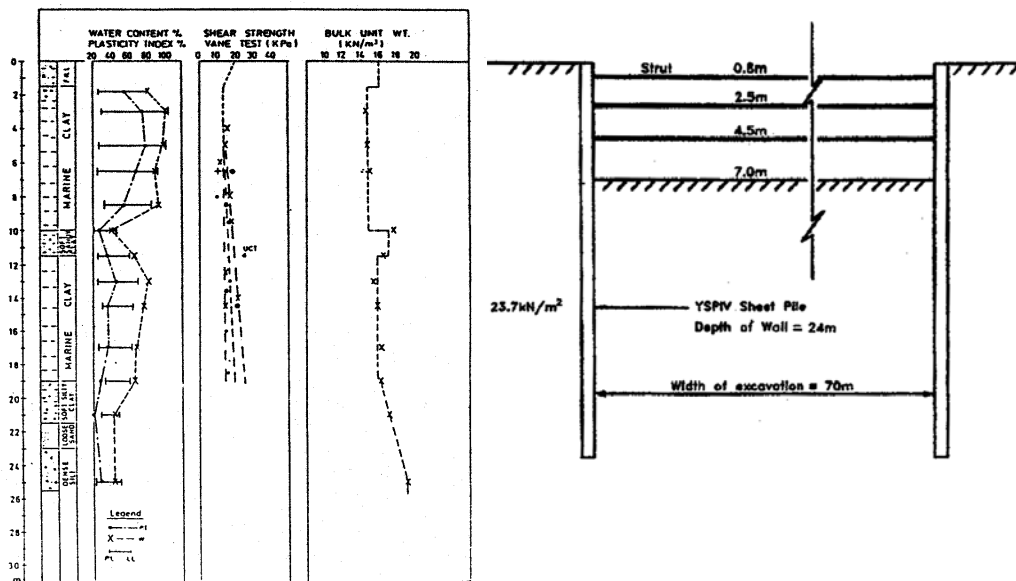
Cross-Section of Excavation at MOE Project (Kok, 1985)
